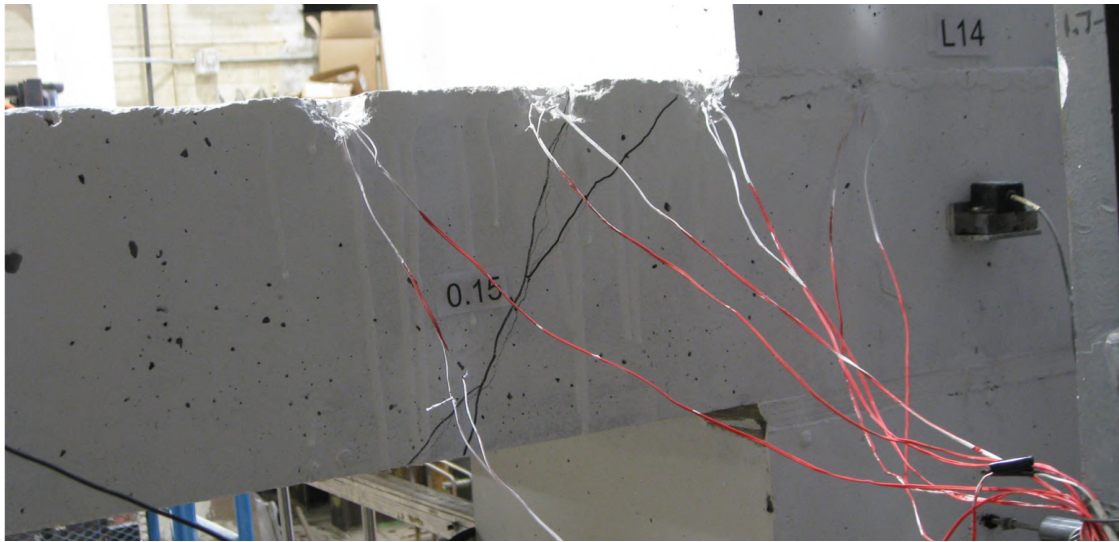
Specimen 3 free edge face cracks at $V = 154.9$ kN (east side)
